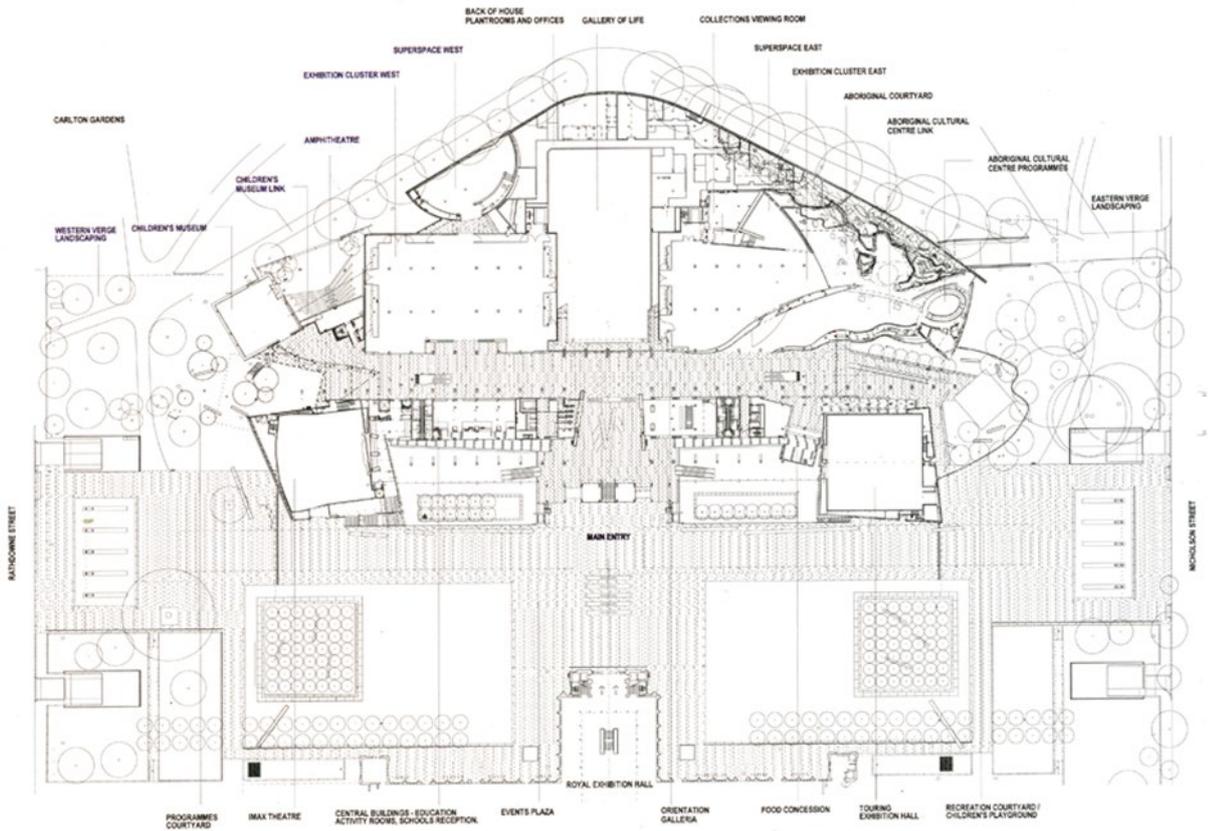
Level 3 (ground) level plan of the Melbourne Museum
